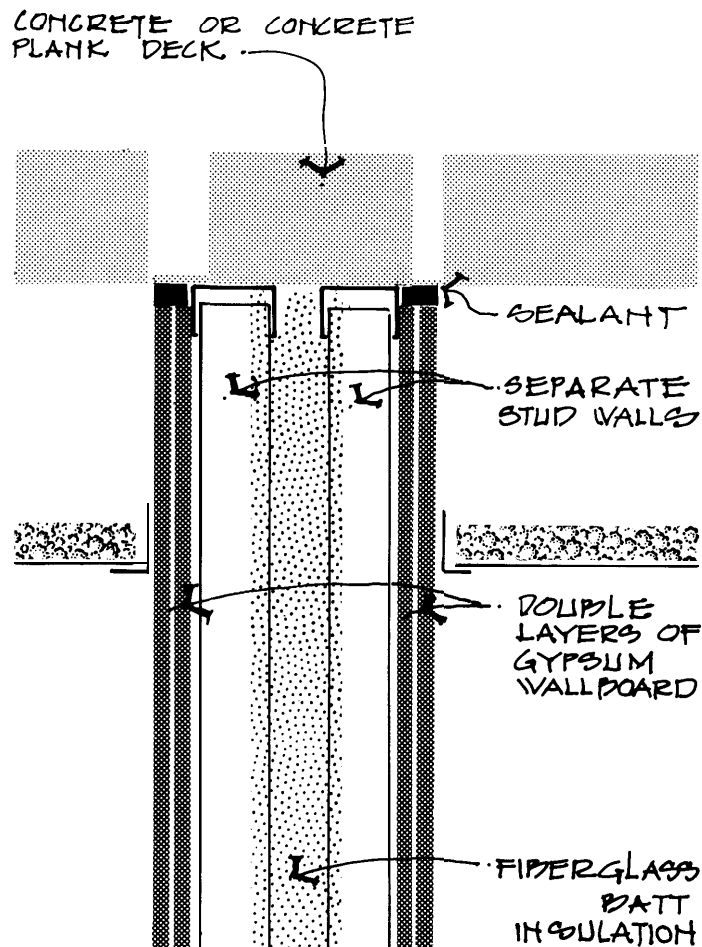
Gypsum Wallboard Construction Between Two Individual Practice Rooms (not recommended)
